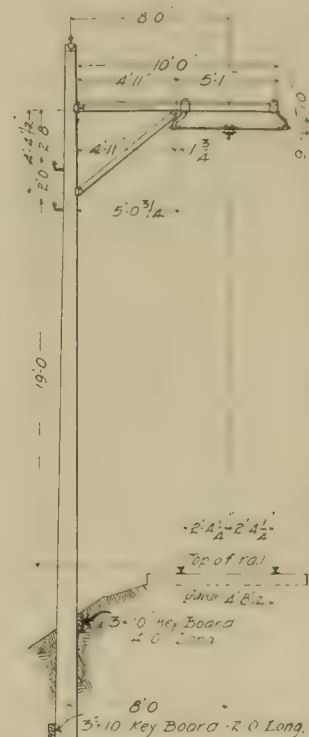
TYPICAL STRAIGHT LINE OVERHEAD CONSTRUCTION.
